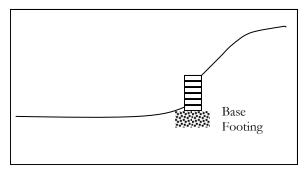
B. Mortared walls require significant footings below grade to maintain vertical position. Additional support provided by anchoring into slope for increased height and use in unstable soils.
